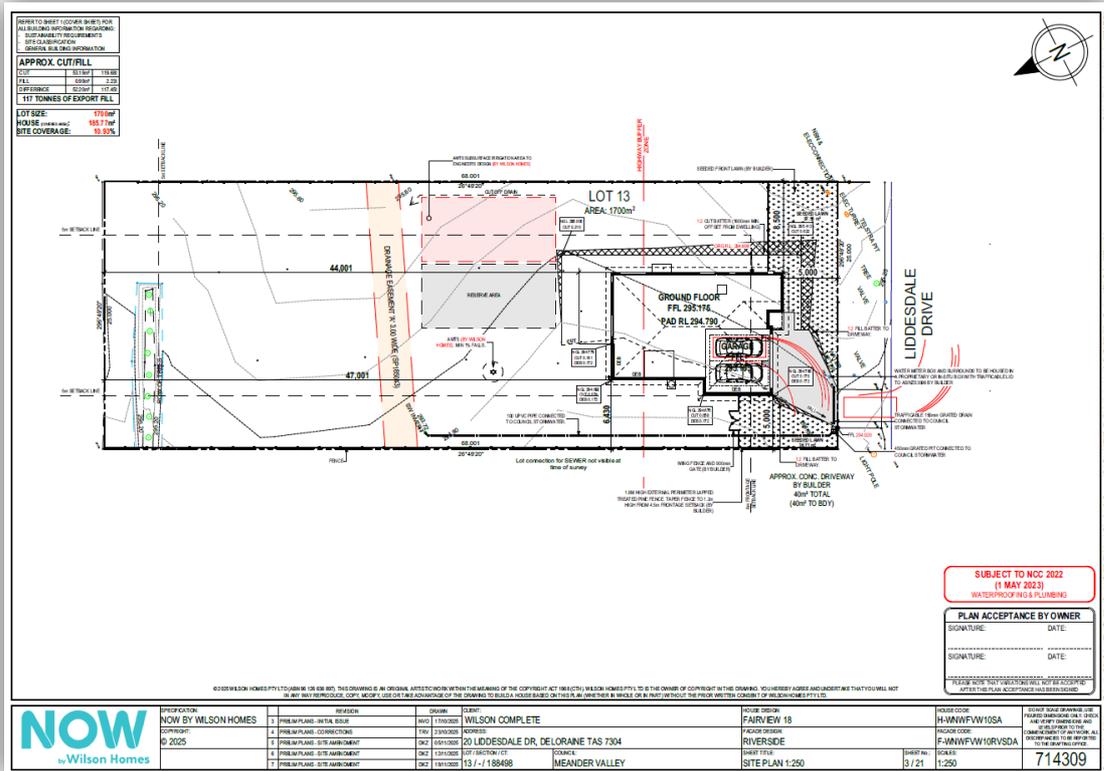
Site plan of proposed dwelling (provided by Wilson Homes).
